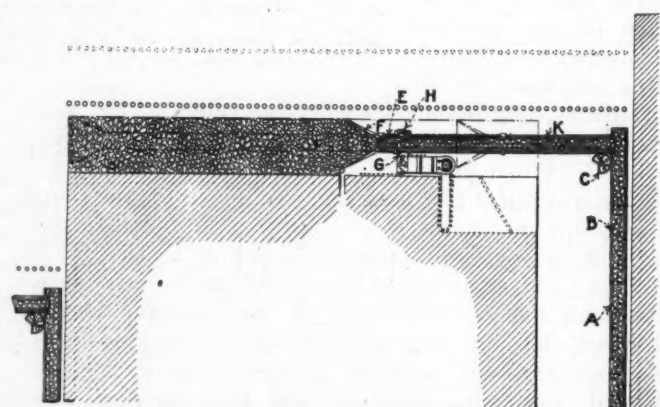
Conveyor Loading Face Coal and Longwall Machine Cutting Coal for Future Loading
